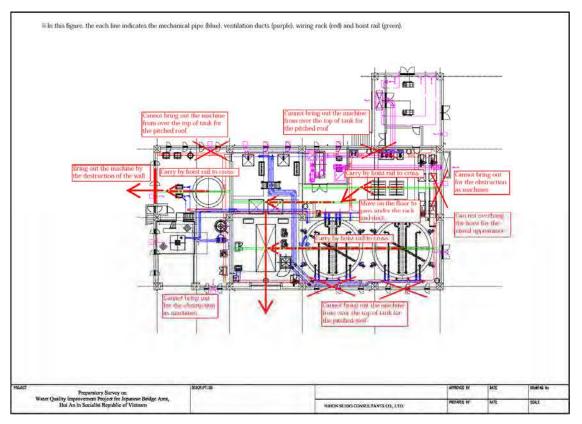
Transportation Route in the Case of Reinforced Concrete (Layout Plan)
